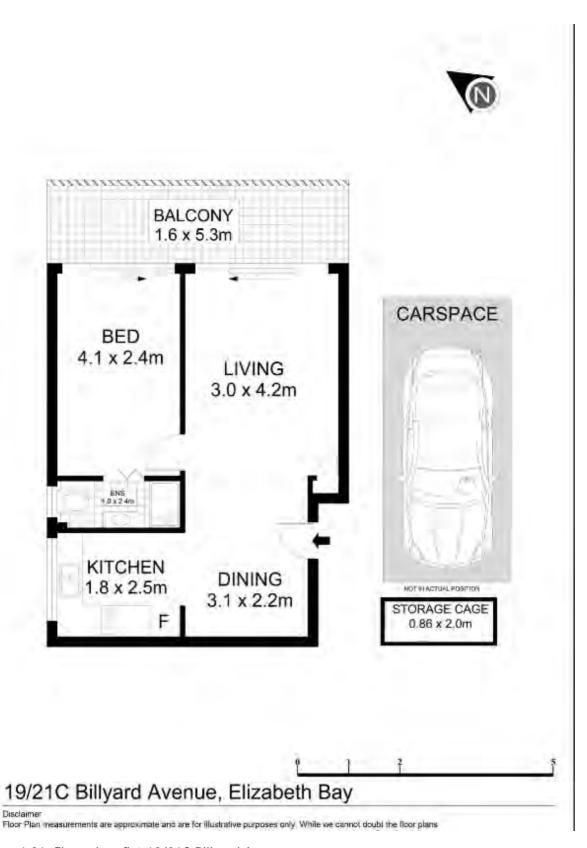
Floor plan, flat 19/21C Billyard Avenue.
